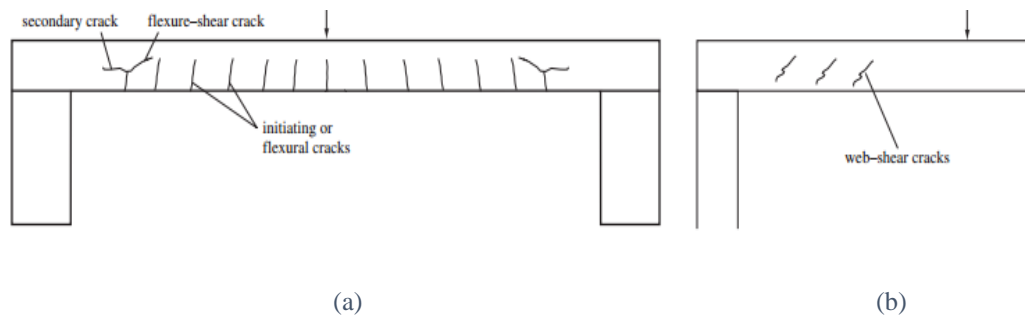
Types of shear cracks; (a) flexure- shear cracks, (b) Web shear cracks
